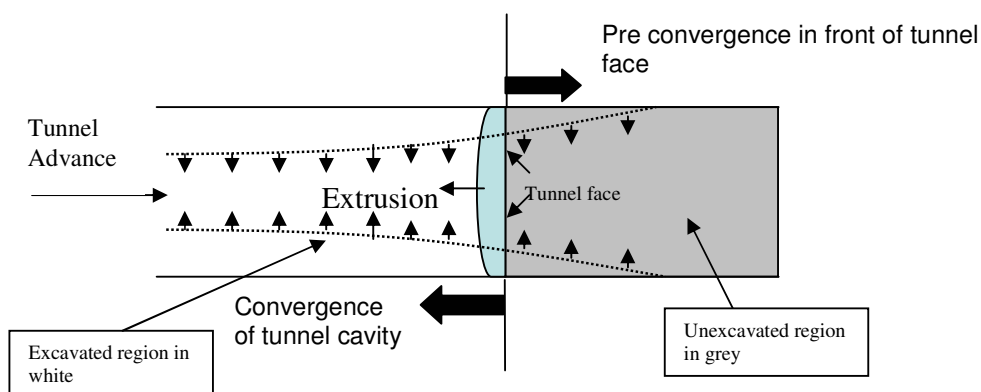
Types of deformation in tunnel excavation (longitudinal cross sectional view).
